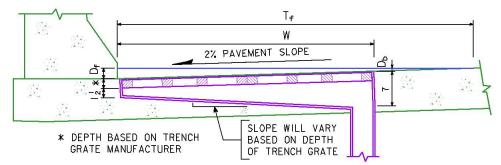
Layout of Aesthetic Deck Drain, BSB SS 1054
